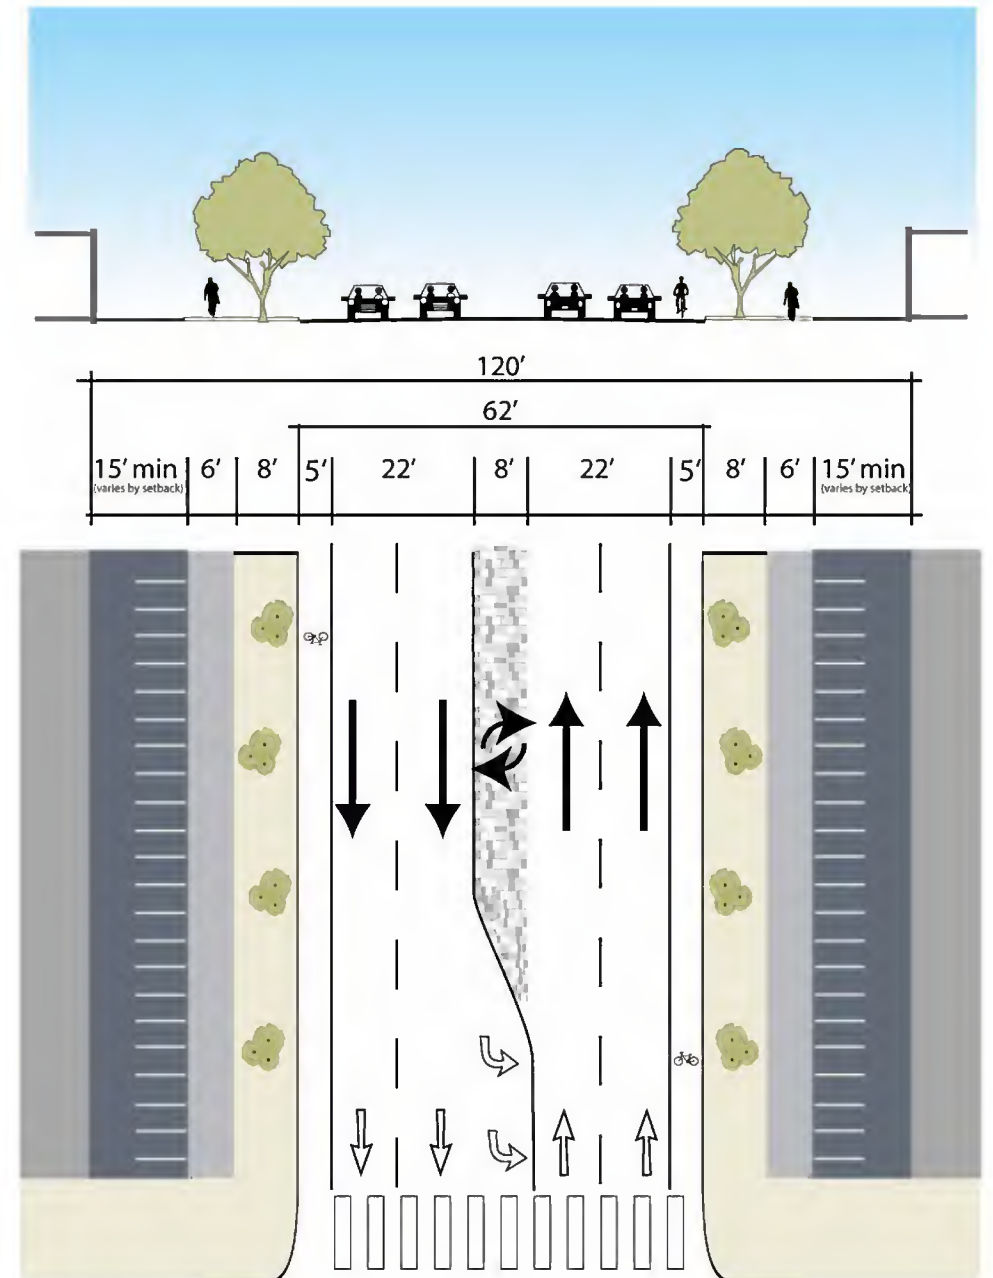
Proposed Broad River Road Suburban/ C3 Thoroughfare Section
